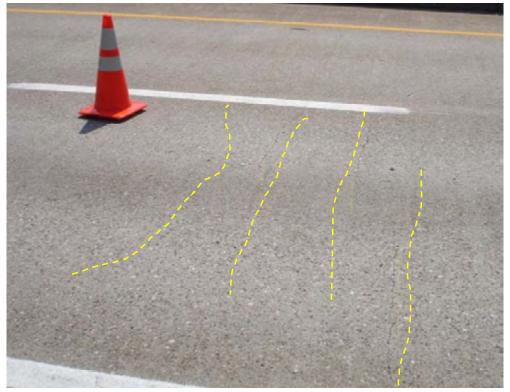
Transverse cracking in Bridge No. 2672S. Cracks are highlighted by yellow dashed lines.
